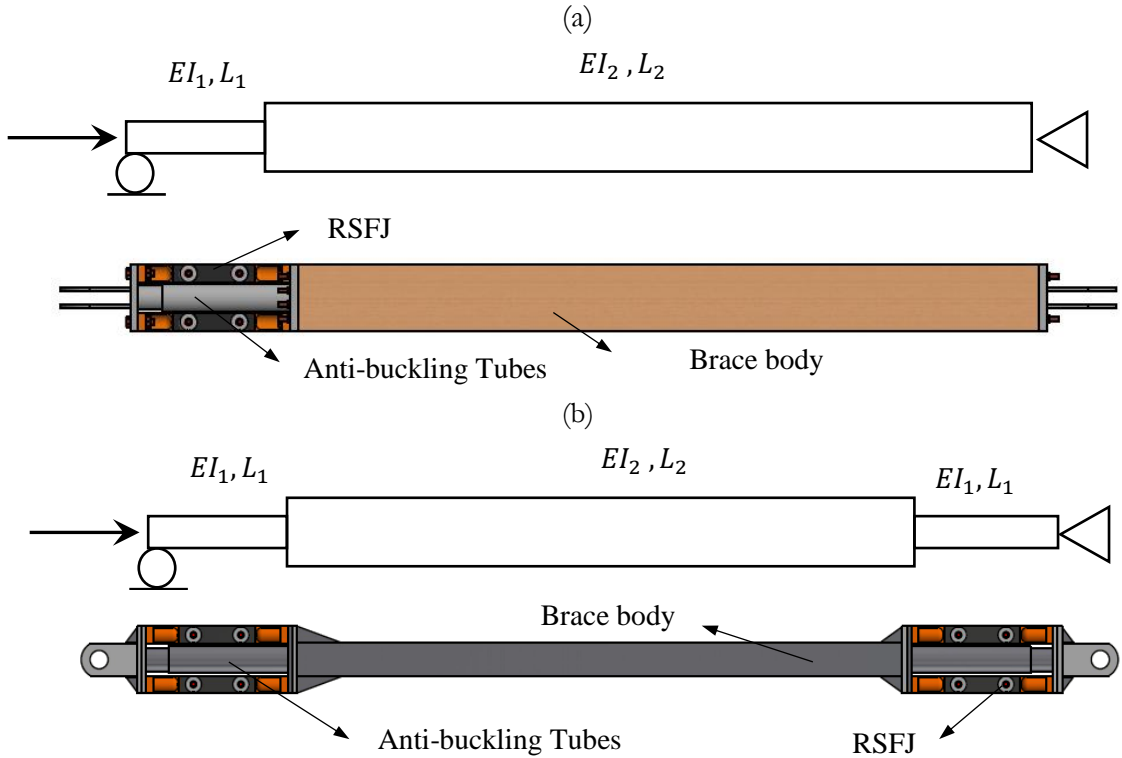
Stepped Column Analogy: (a) Column with one stepped section [125] and (b) column with two stepped sections – section 2.14 [126]
